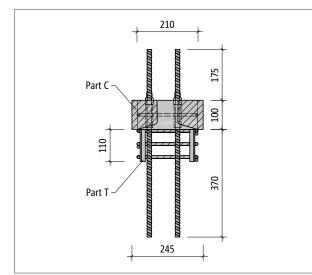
Schöck Sconnex[®] type P: Product section Part C and part T
